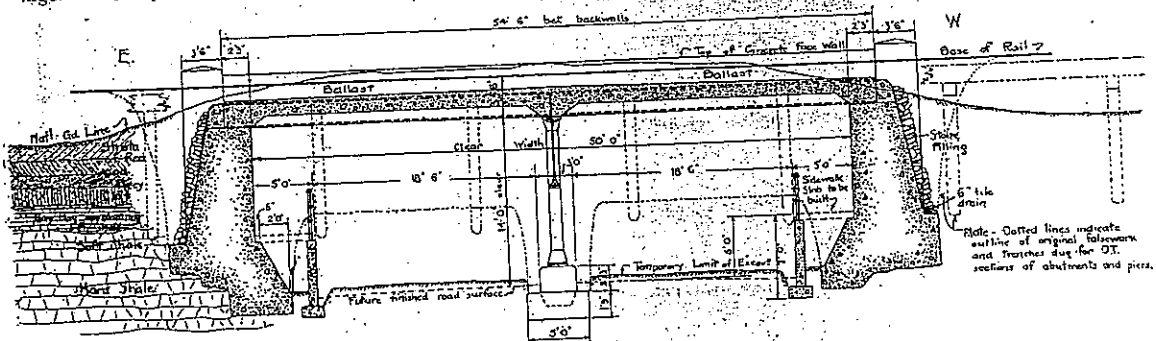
Cross-section of Bridge on Centre Line of Railway.
